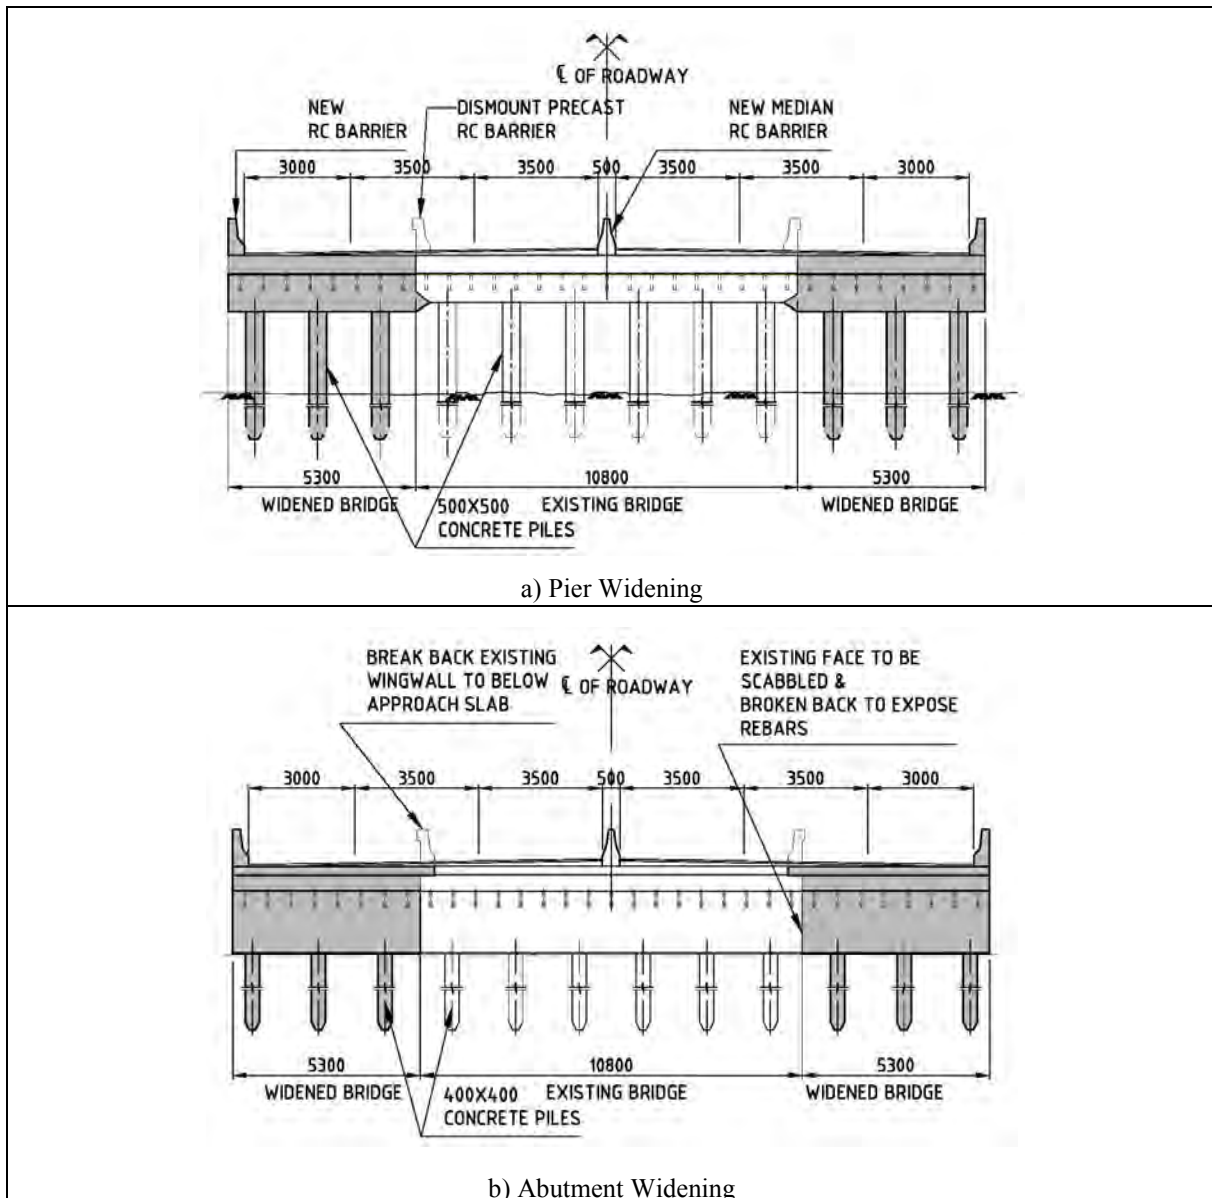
Typical Cross-Section of Substructure Widening for Full 4-Lane
